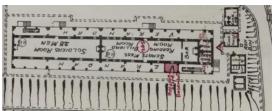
1913 G/F Plan, extracted from the 1913 Whitfield Barracks Skeleton Record Plan, sheet 2/3 (Source: TNA WO78#3744)
